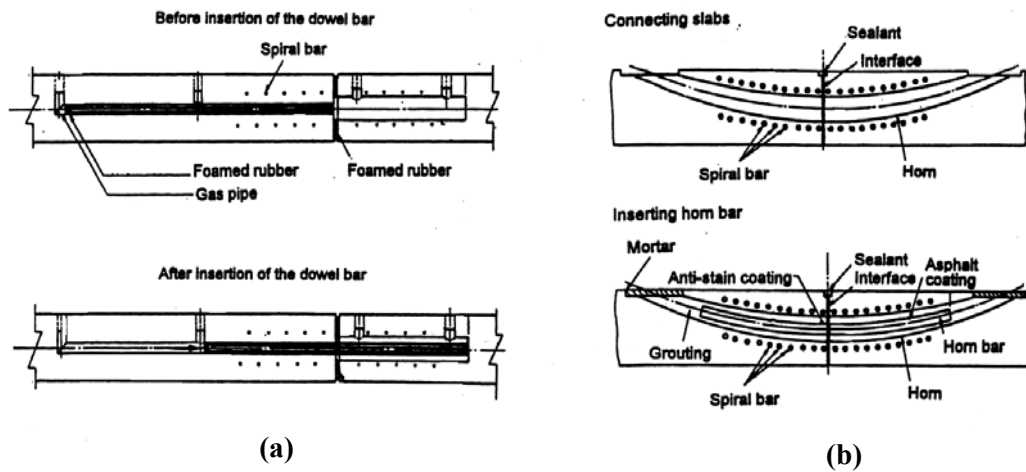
Joint details for precast pavements in Japan (Ref 5)
